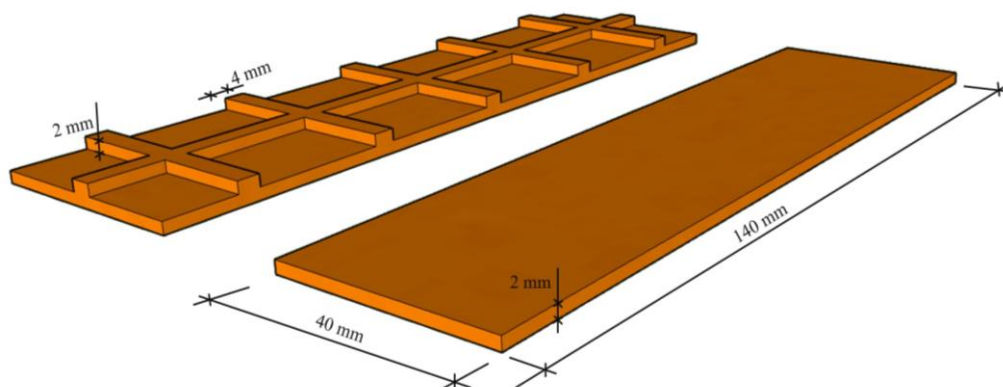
Dimensions of the reinforcement element for prism specimens 40×40×160 mm.
